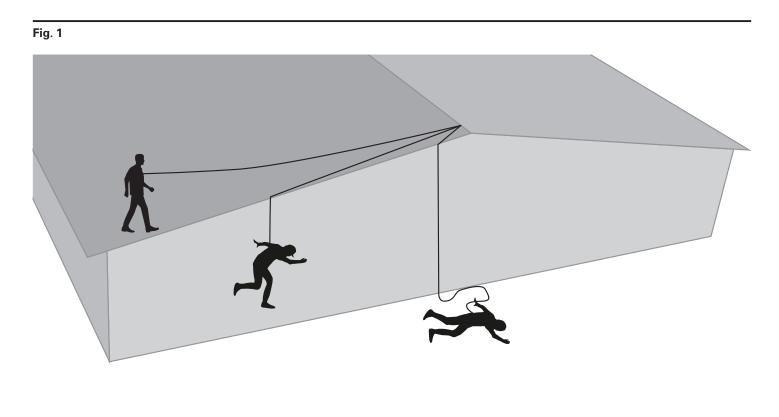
below shows a user at the full extent of his rope at the eaves of the roof close to the exposed gable end. As the extended length of the rope is longer than the building height, should the user fall from the gable end, they would have inadequate free-fall clearance for the system to work effectively.
